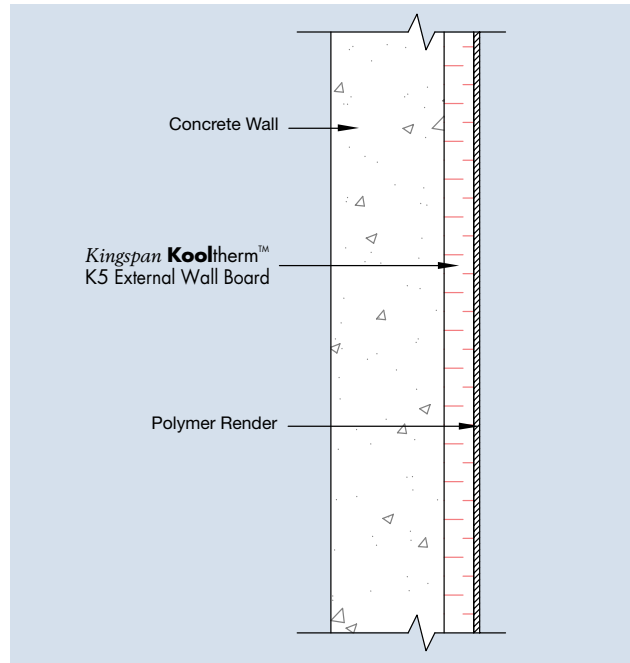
Side elevation of Kingspan Kooltherm™ K5 External Wall Board insulated render system on concrete wall
